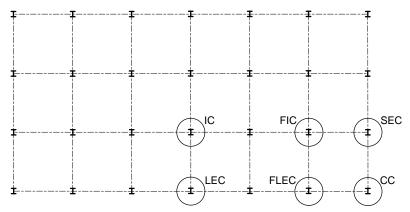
Location of the removed columns on buildings' plan (IC: Internal Column, FIC: First Internal Column, SEC: Short Edge Column, LEC: Long Edge Column, FLEC: First Long Edge Column, CC: Corner Column)
